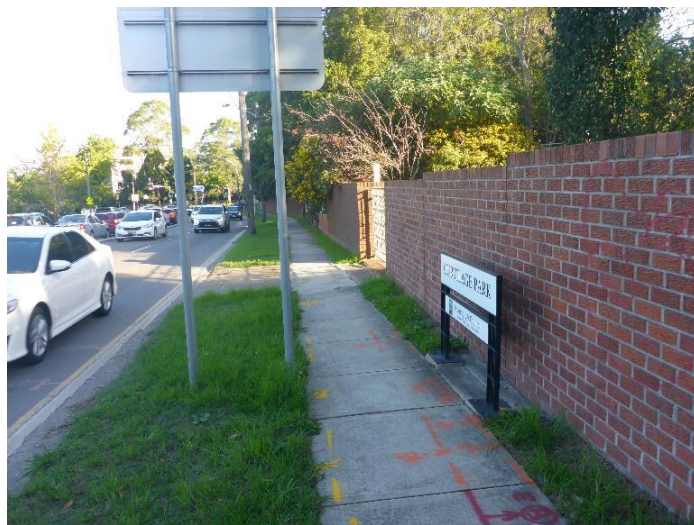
Modern brick boundary wall of Curtilage Park and the Mahratta site [12] and adjacent road reserve, facing south-east
